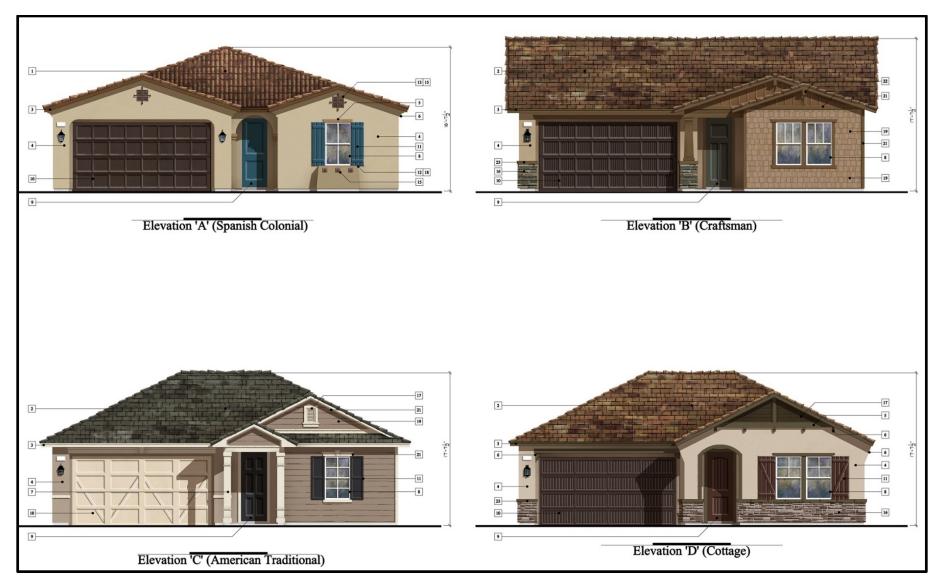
FLOOR PLANS & ELEVATIONS: Plan 6
